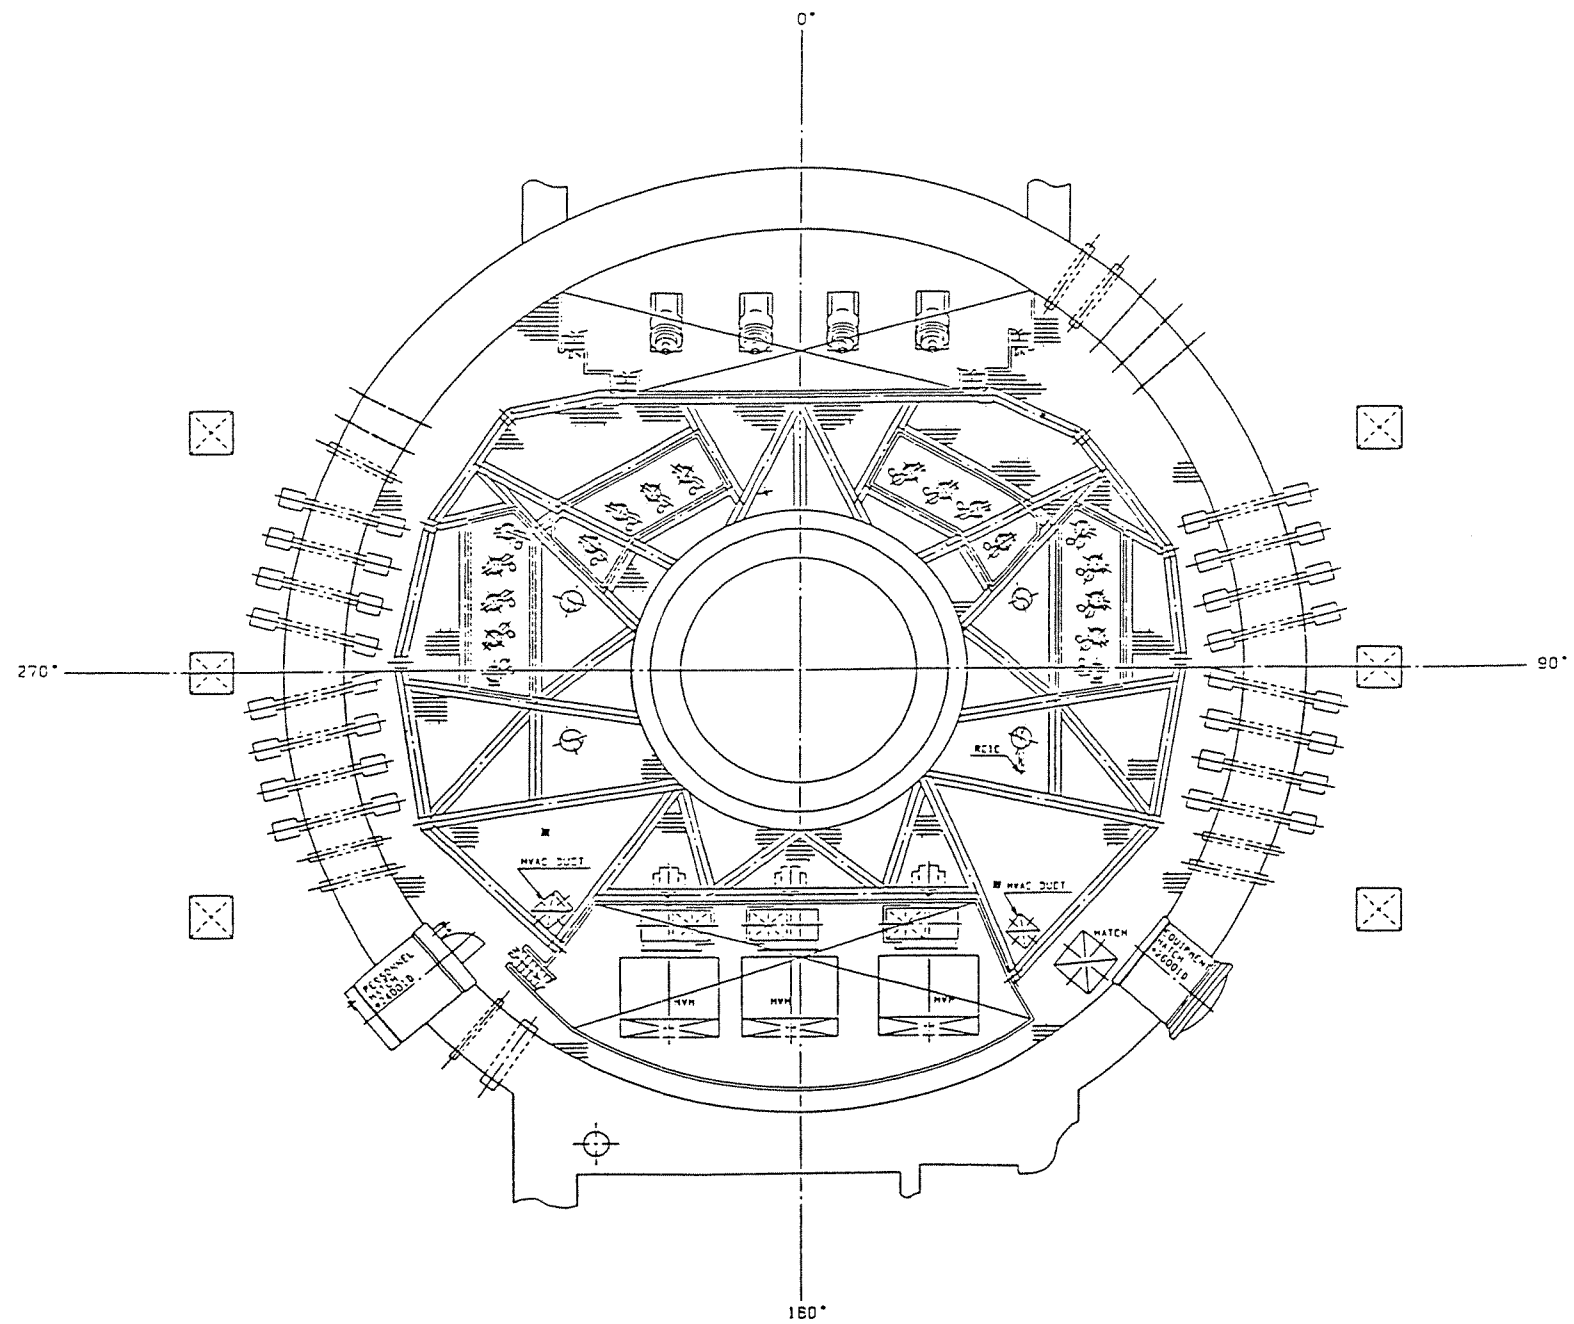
DRYWELL, ARRANGEMENT PLAN AT ELEVATION 15,600mm
